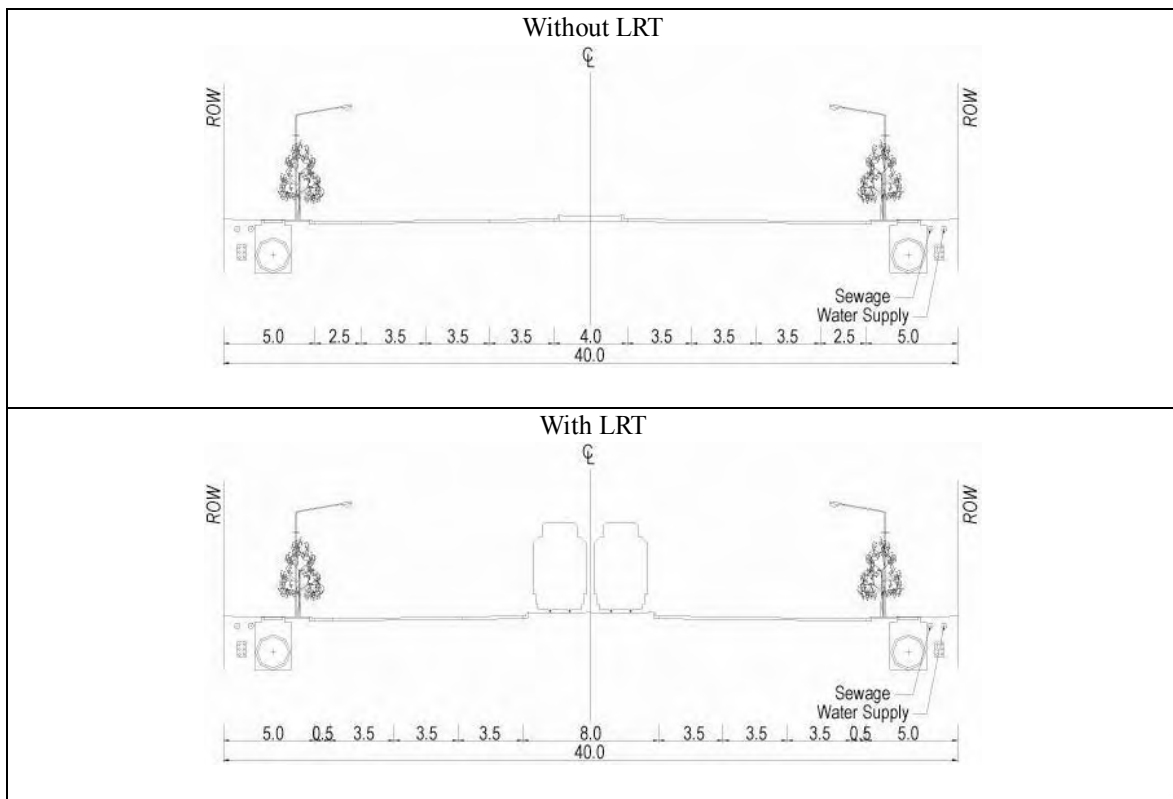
Typical Cross-section of a Primary Road (Type C: ROW = 40m)
